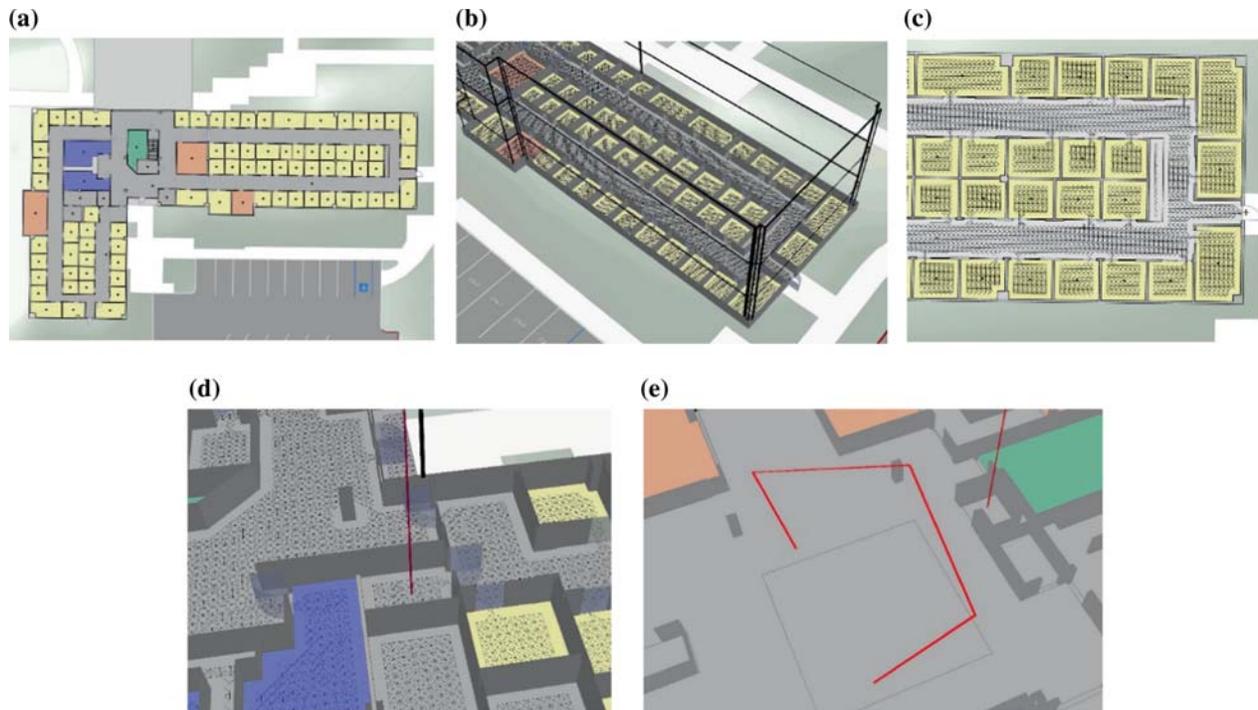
The Indoor Network process, a spaces centerlines, b lattice, c ground floor entry, d vertical transition lines—elevator, e vertical transition lines—stairs (The Authors, 2018)
